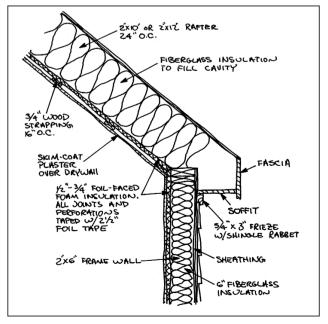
Martha's Vineyard builder John Abrams prefers a "hot roof," that is, one with no ventilation at all. Success with this, he says, depends on a flawless vapor barrier and dry
